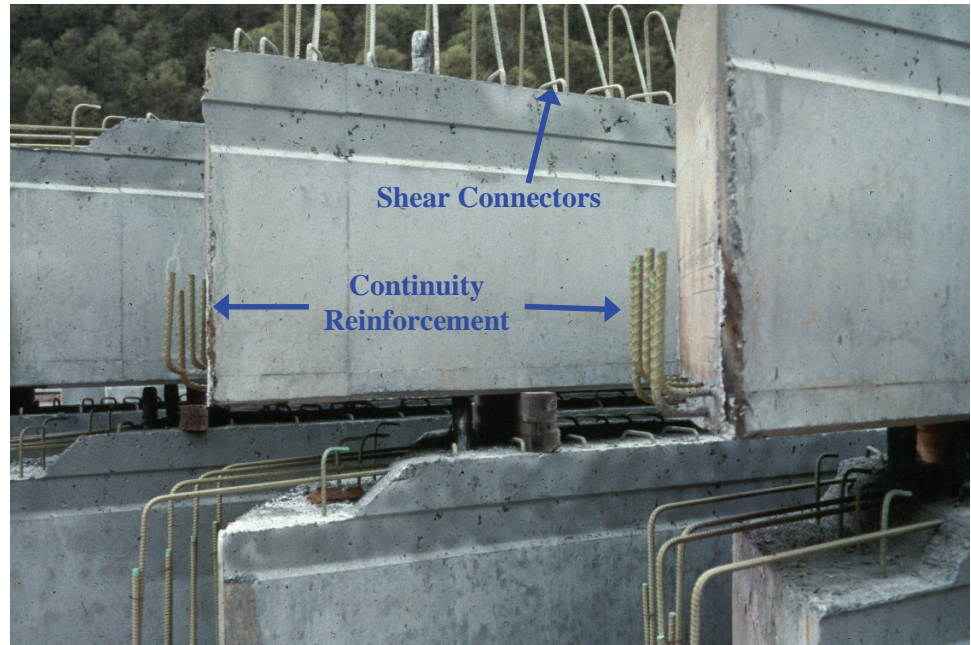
Box Beams at Fabrication Plant Showing Stirrups Extended as Shear Connectors and Extended Rebar for Continuity
